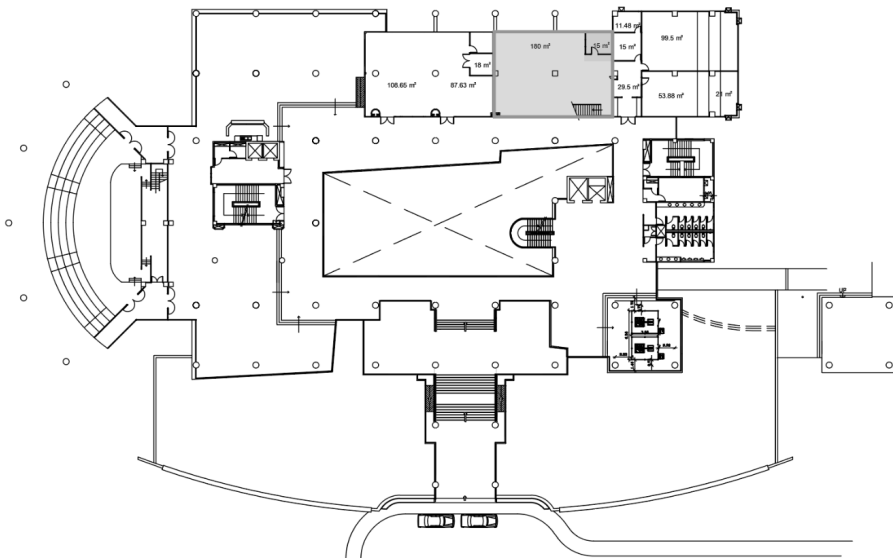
Faculty library on the second floor of the Faculty of Architecture building.
